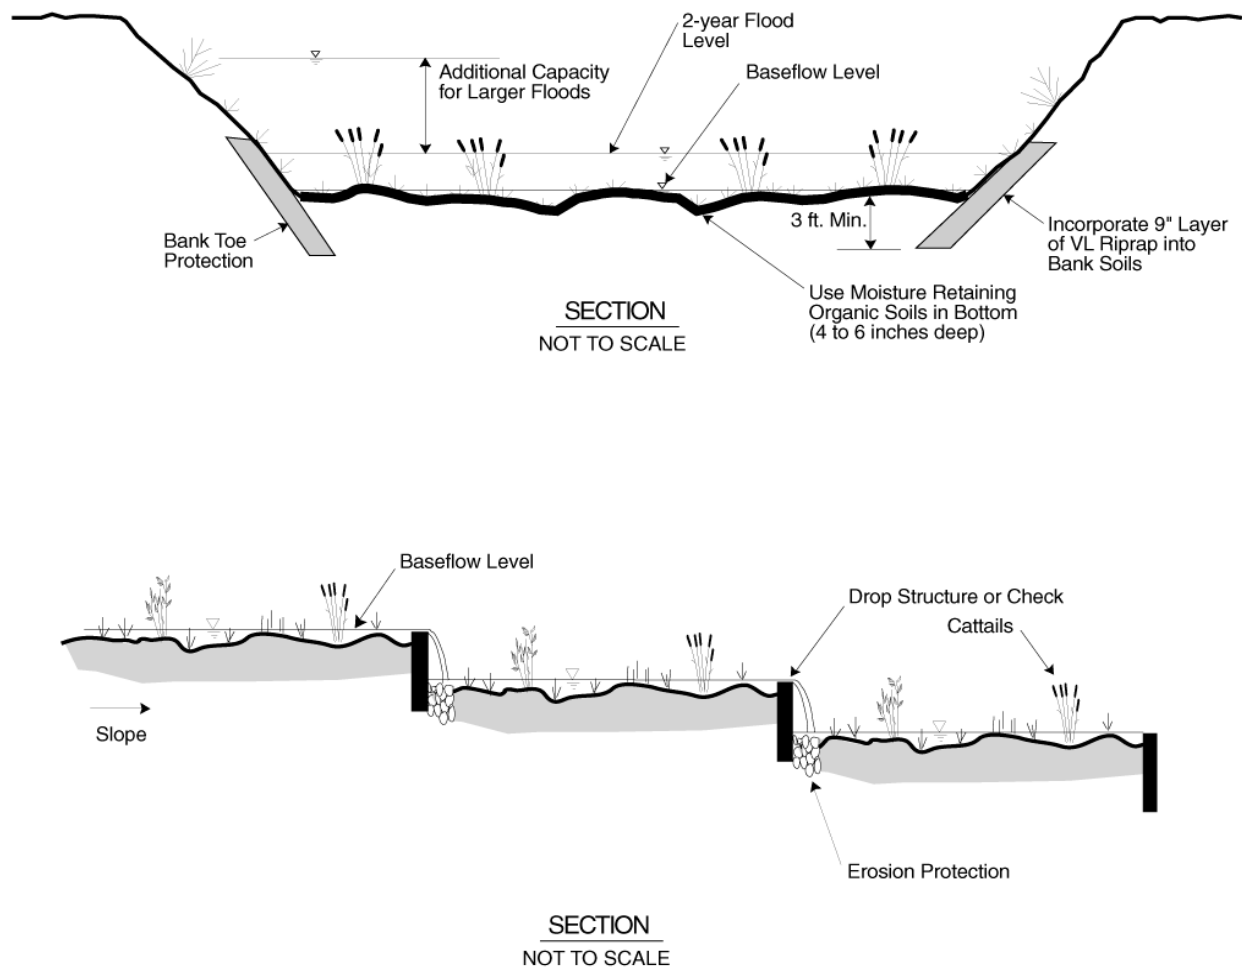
Constructed Wetland Channel Typical Plan and Profile
